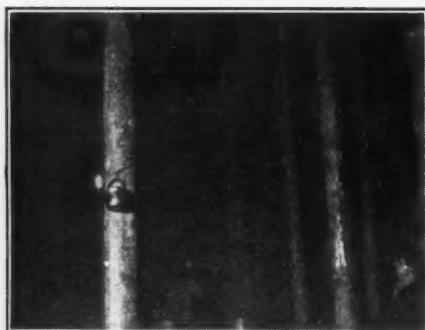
SHOWING TIMBERS USED TO SUPPORT THE ROOF
